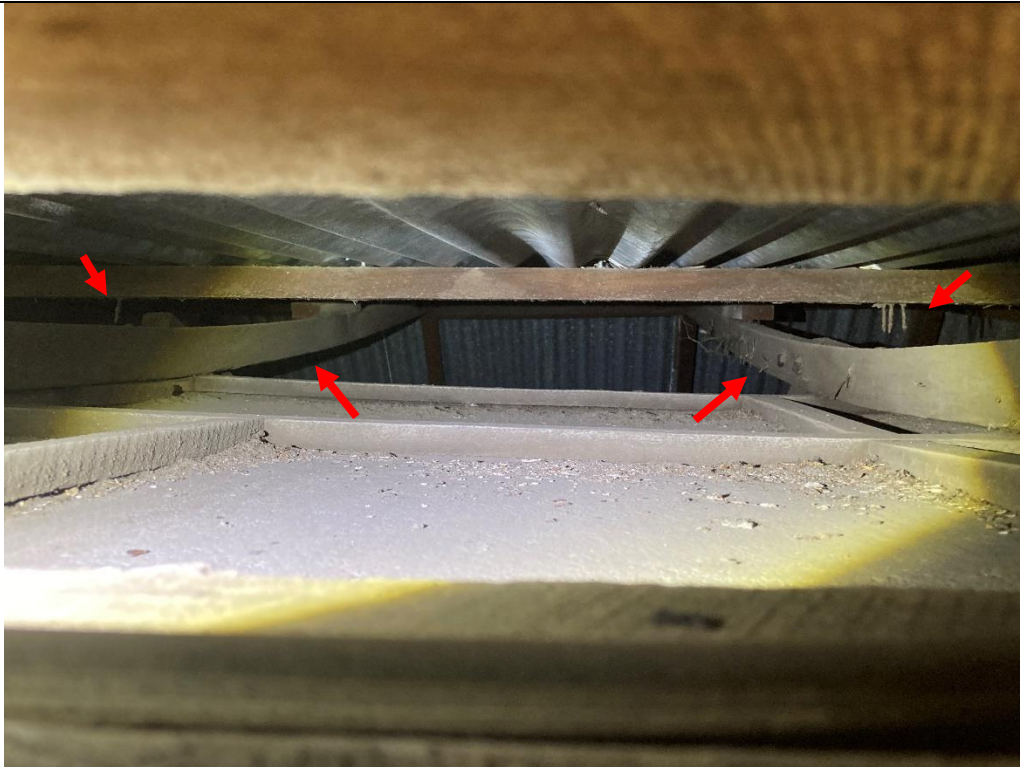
Observed sagging rafter beams and loosened nail connections to purlin.
